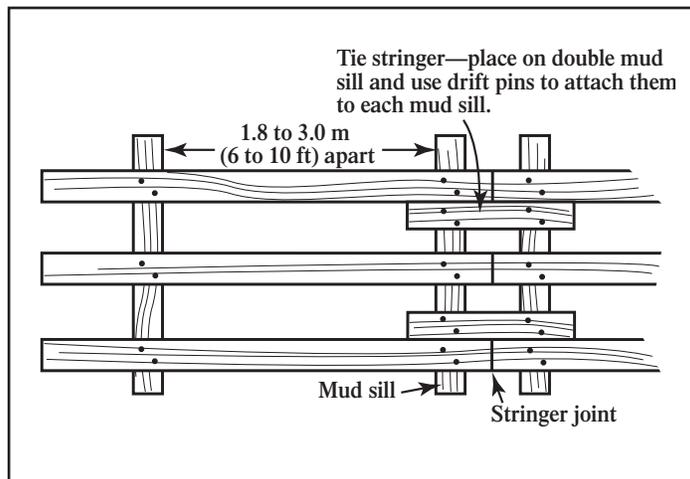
Proper layout of puncheon, showing mud sills and stringers.
